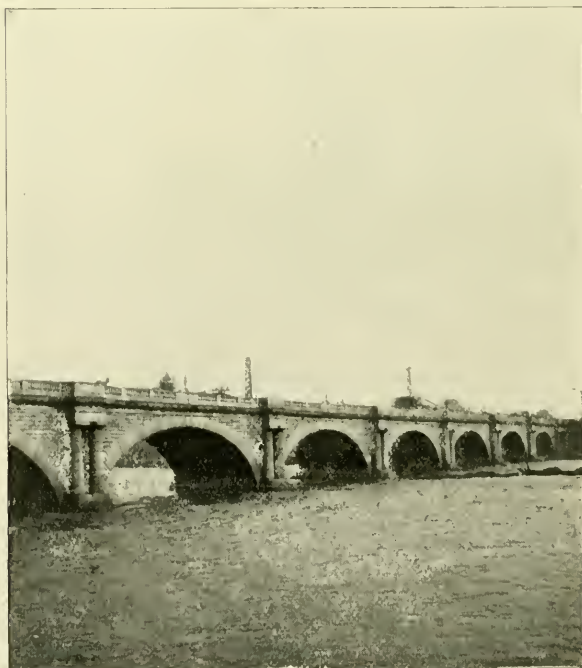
WATERLOO BRIDGE OVER THAMES, LONDON.
